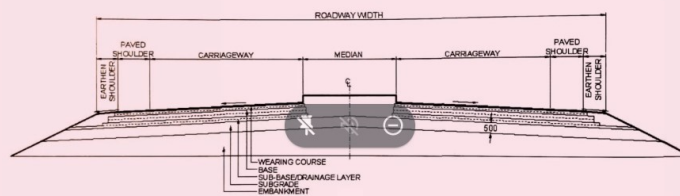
Terms Used in the Specifications to Describe Road Cross-Section Elements of a Dual Carriageway
